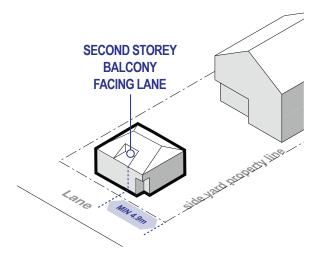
Upper decks should be oriented towards the lane where applicable and set back from side yards to avoid overlook onto adjacent properties.
